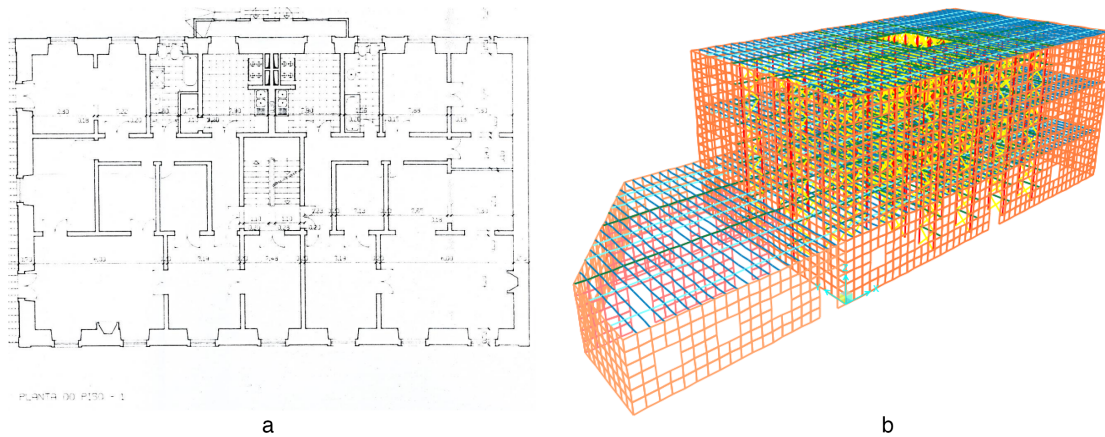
a) Plan view of the first floor of the original building; b) Three-dimensional model
